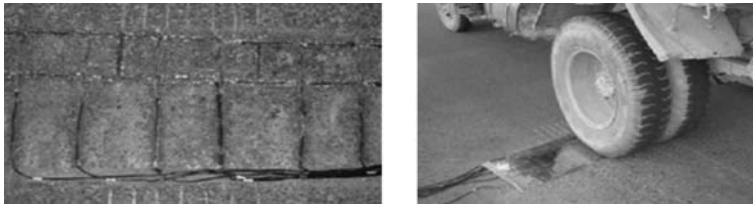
Scheme of strain measurement of the pavement on bridge deck.
